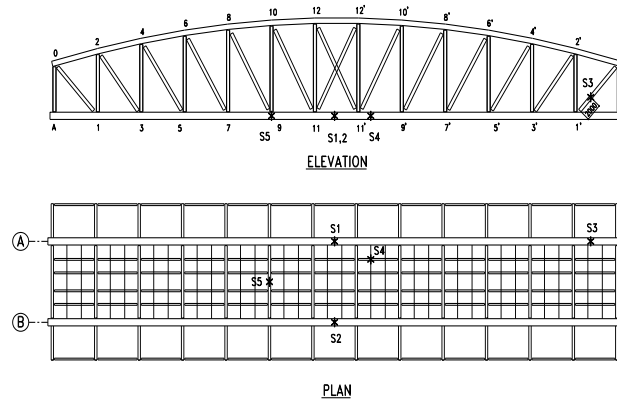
Imbaba Railway Bridge static testing plan layout for strain gauge locations.
